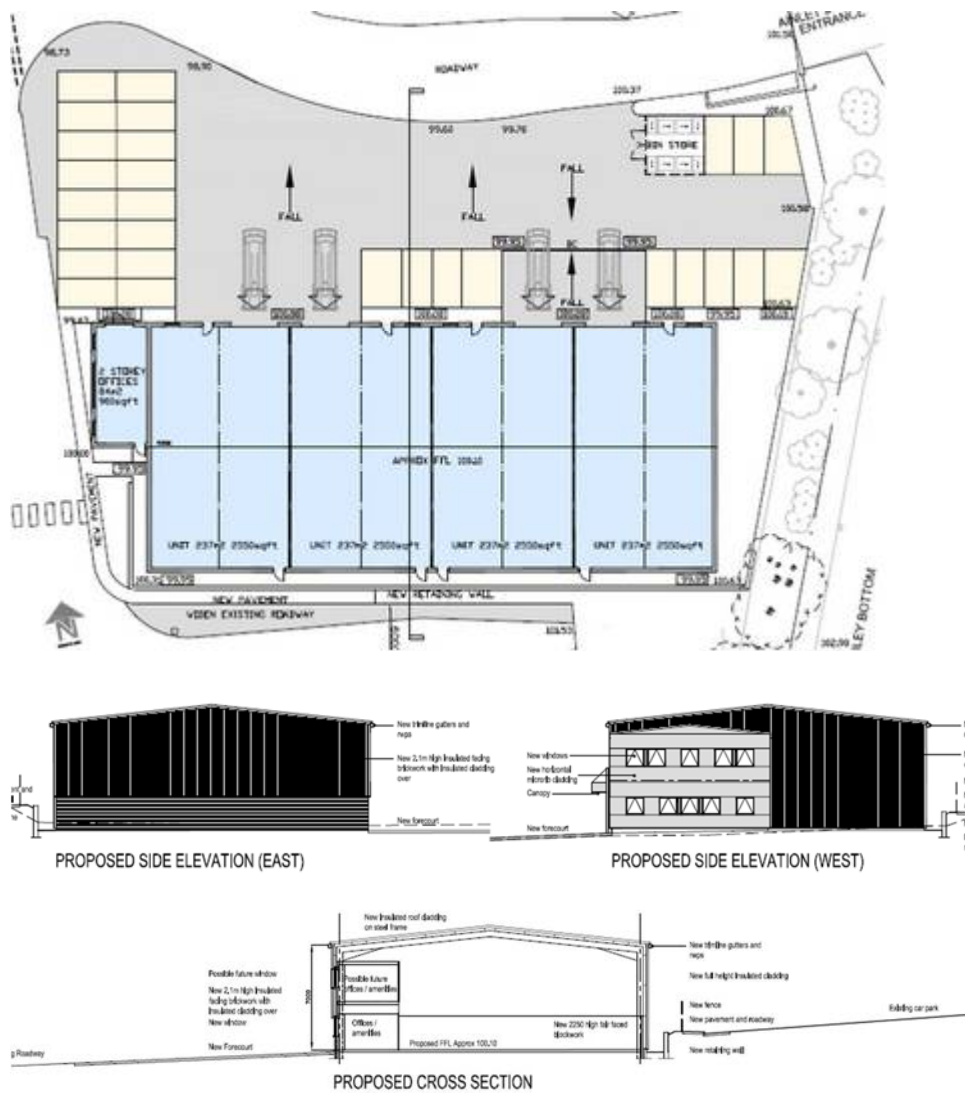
CGI and layout of Nano Park scheme near M606, Bradford
